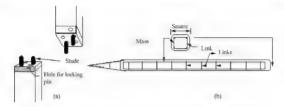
(a) concrete pile connecting detail. (b) squared pre-cast concrete pile
